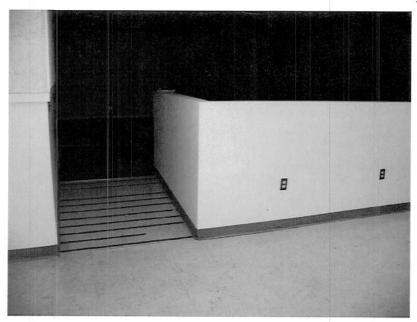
Room B11 had a partial raised floor. This room had a "musty" odor but the source was not identified. It is most likely beneath the raised floor (which is overlain with carpet tiles) or in the wall cavity shared with the corridor.
